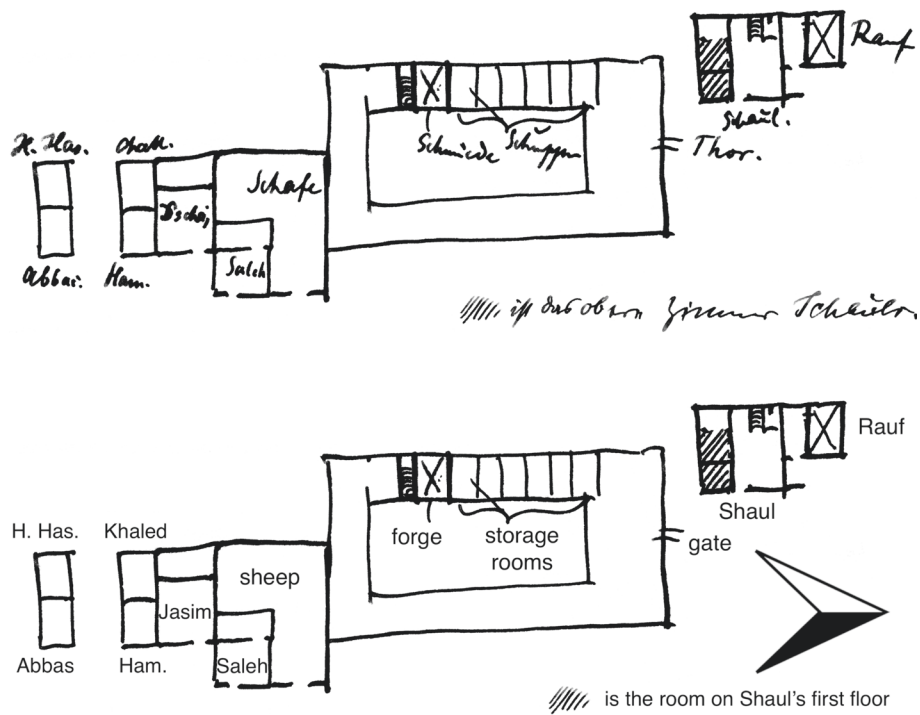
Sketch plan of the surrounding buildings and newly added rooms in the west wing of the expedition house, as sketched by Walter Andrae in a letter to Robert Koldey on 29 March 1904 (SMB-ZA, III/DOG II 1.2.10.9). Top: Andrae's original, bottom: with translated labels and a north arrow, prepared by Jana Richter.
